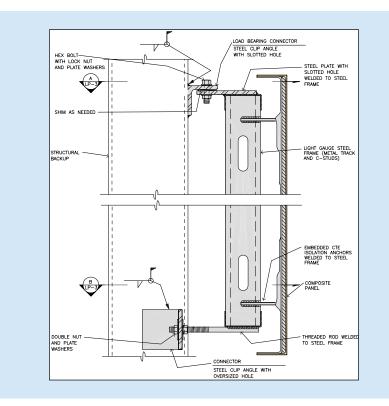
Section view: FRP panels with steel frame support – Type 1
